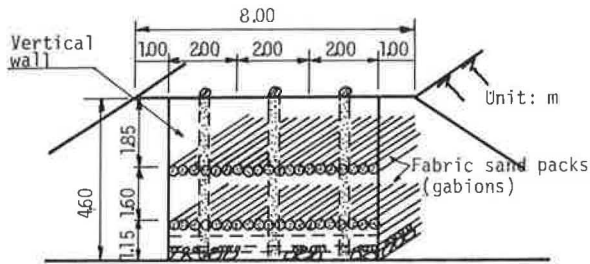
Front view of gabions placed in backfill behind vertical wall of cantilever retaining wall.
